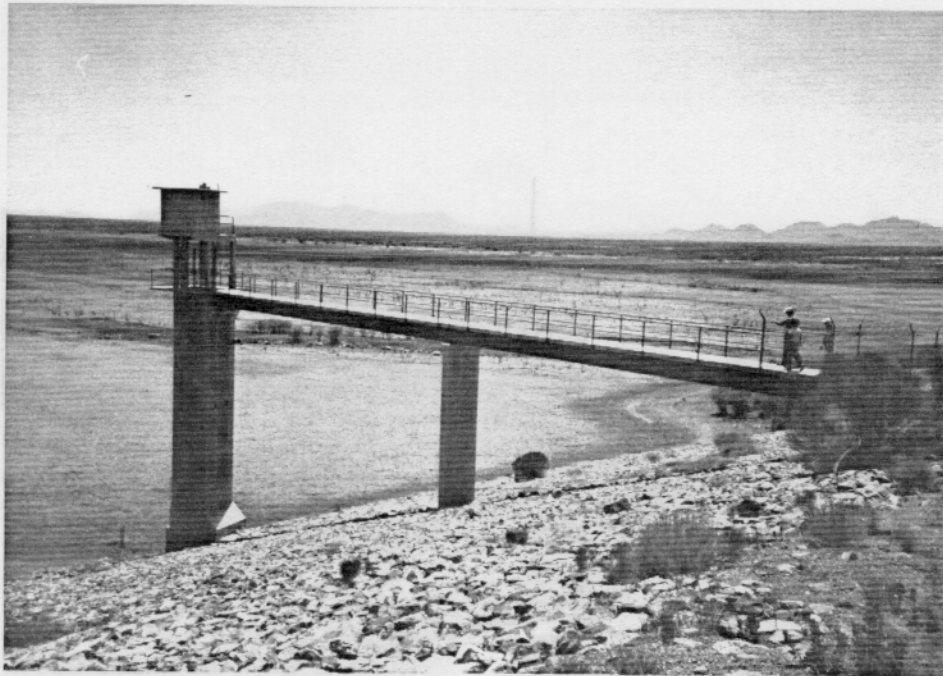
Conservation Outlet Works Intake Tower and Access Bridge (looking southwest from the main dam embankment).
